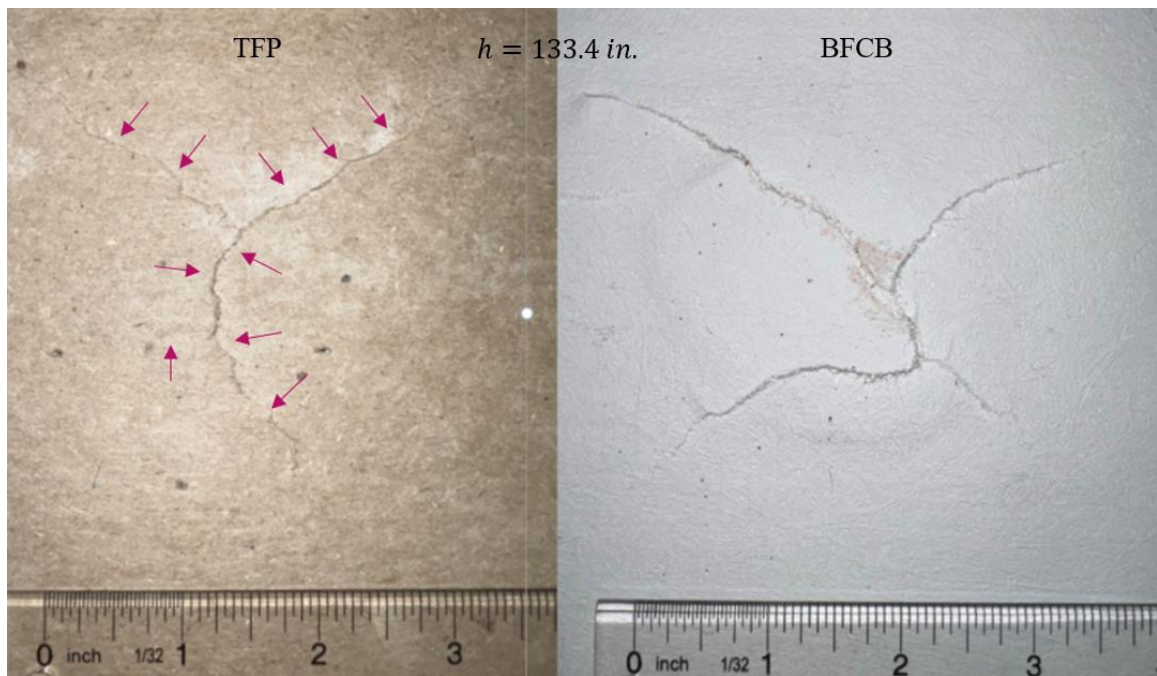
Cracks on BFCB and TFP, $h = 133.4 \text{ in.}$
